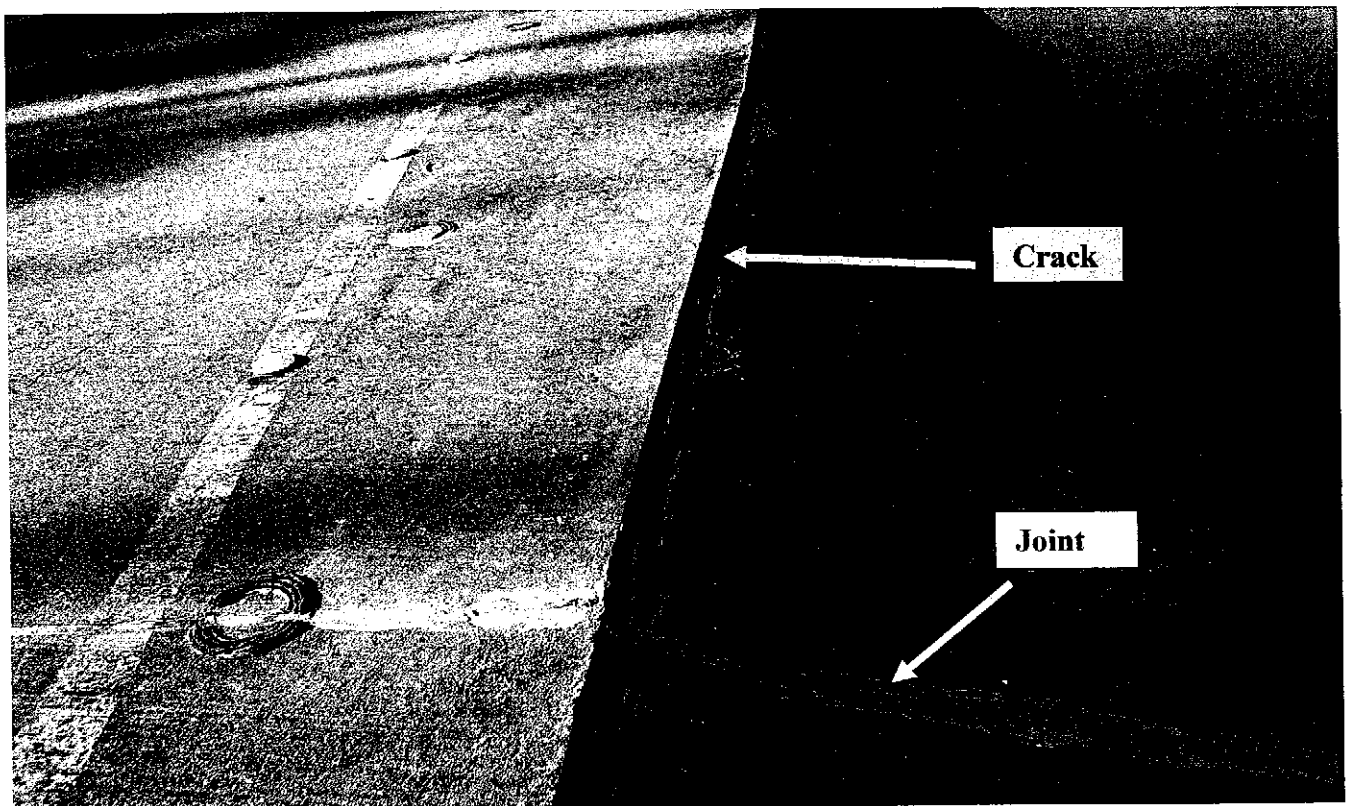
Upstream slope. View is looking south from the left end of the dam. An open joint was present between the dam crest and upstream slope along the entire length of the embankment. Additionally, the sealant in the joints between the concrete panels on the slope was deteriorated.
